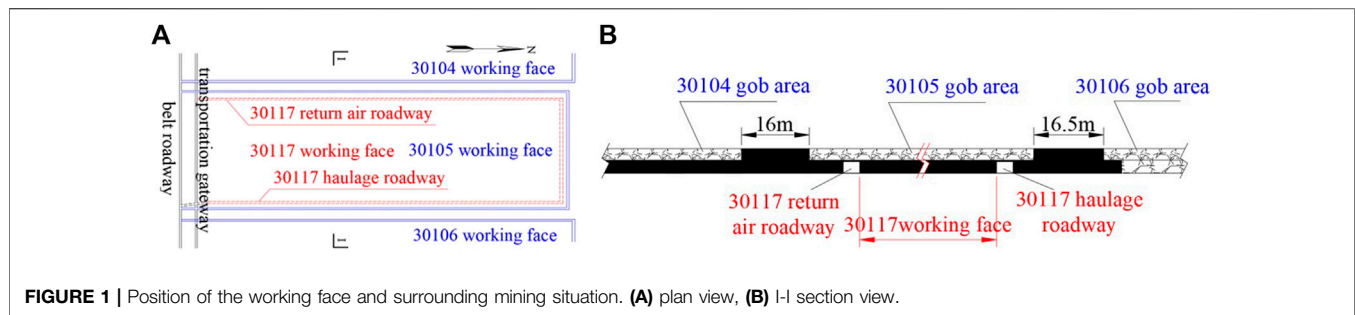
| Position of the working face and surrounding mining situation. (A) plan view, (B) I-I section view.
